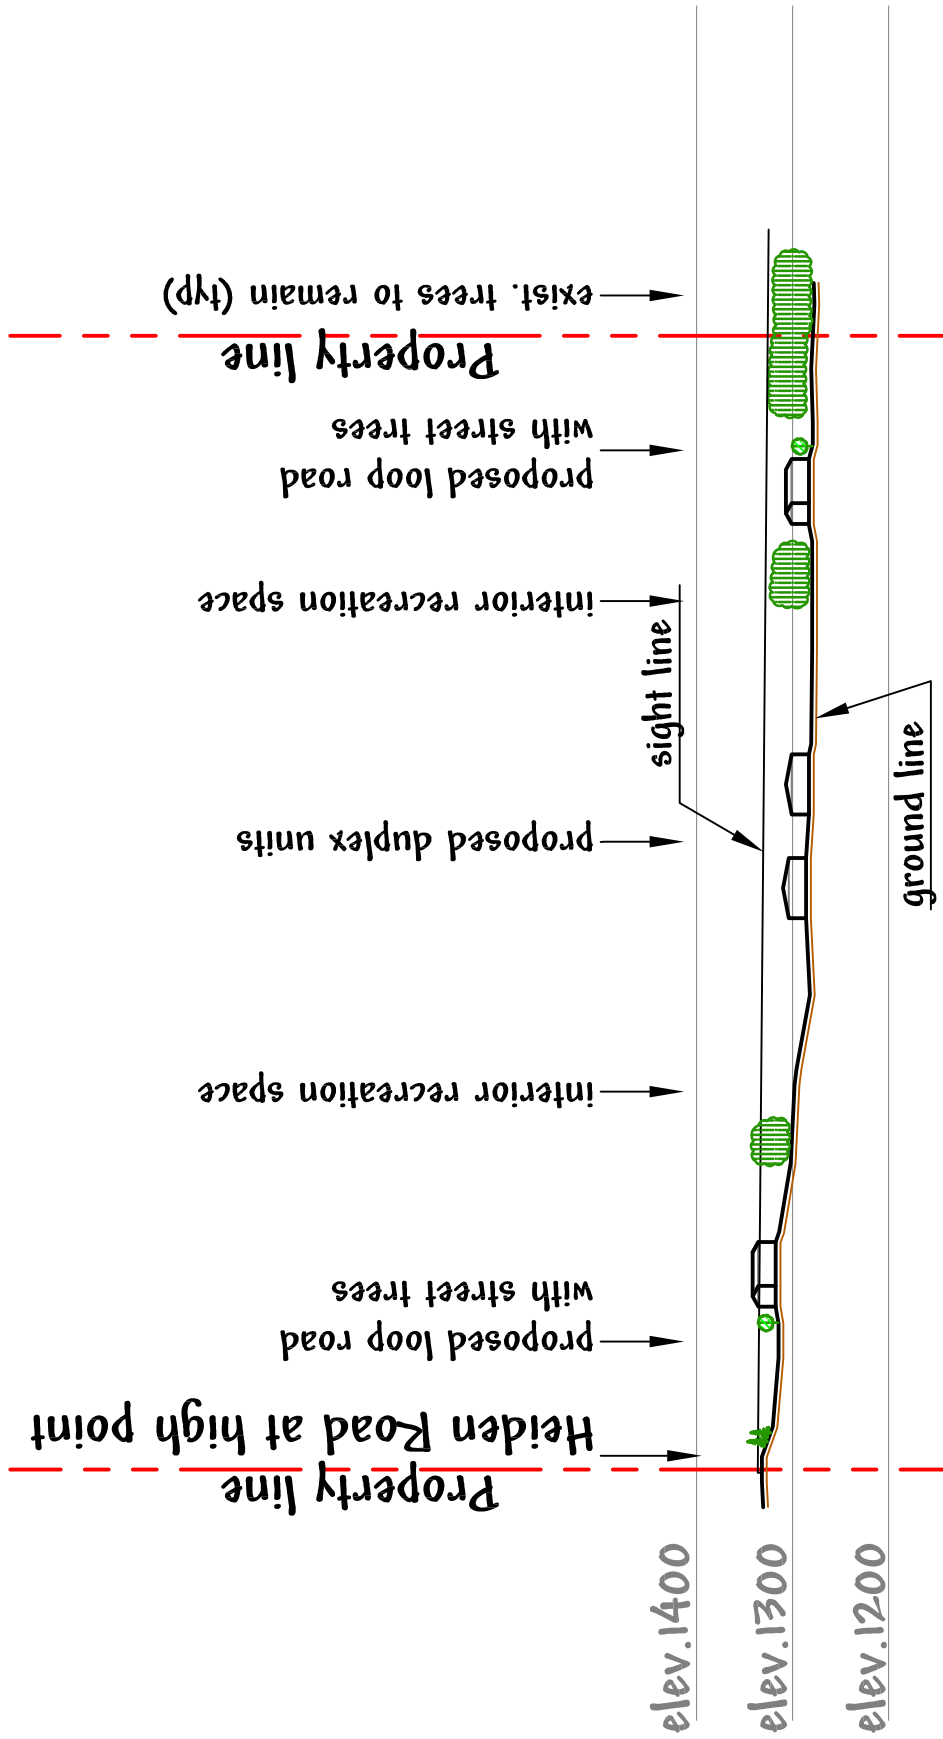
View Point 3 - Looking South on Heiden Road
